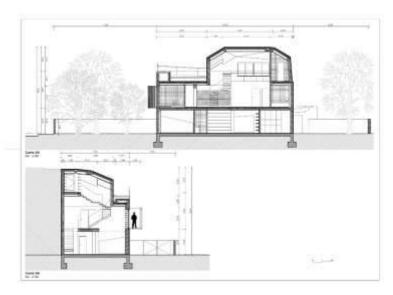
House in Miramar / e | 348 Arquitectura, Portugal, section
